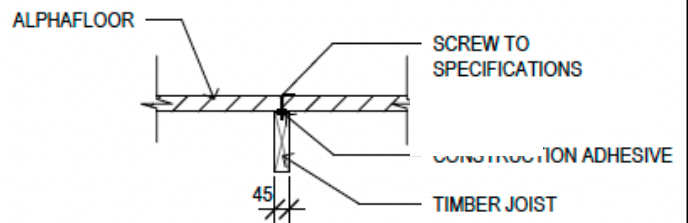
ALPHAFLOOR® FIXING AT END OF PANELS TO TIMBER JOISTS
